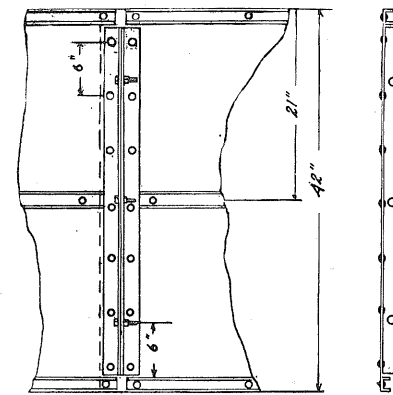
OUTSIDE FORM SHOWING ELEVATION AND SECTION THROUGH JOINT
